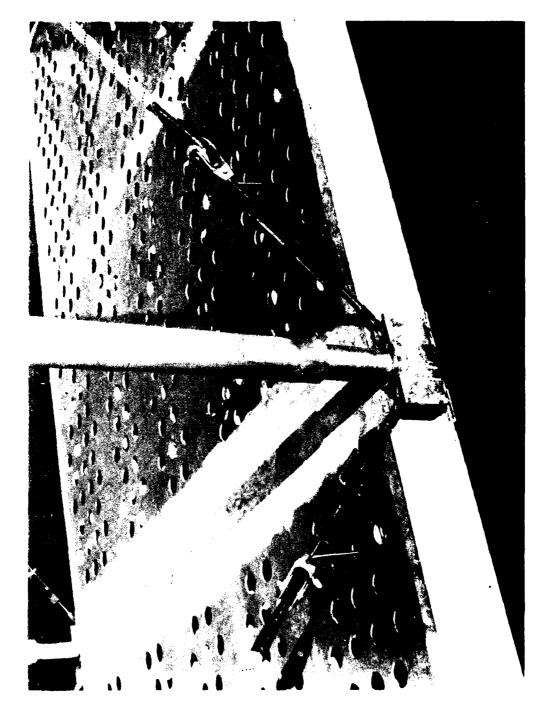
I-bar diagonal end fitting and center column installed at center of floor structure - HEGS-20.
